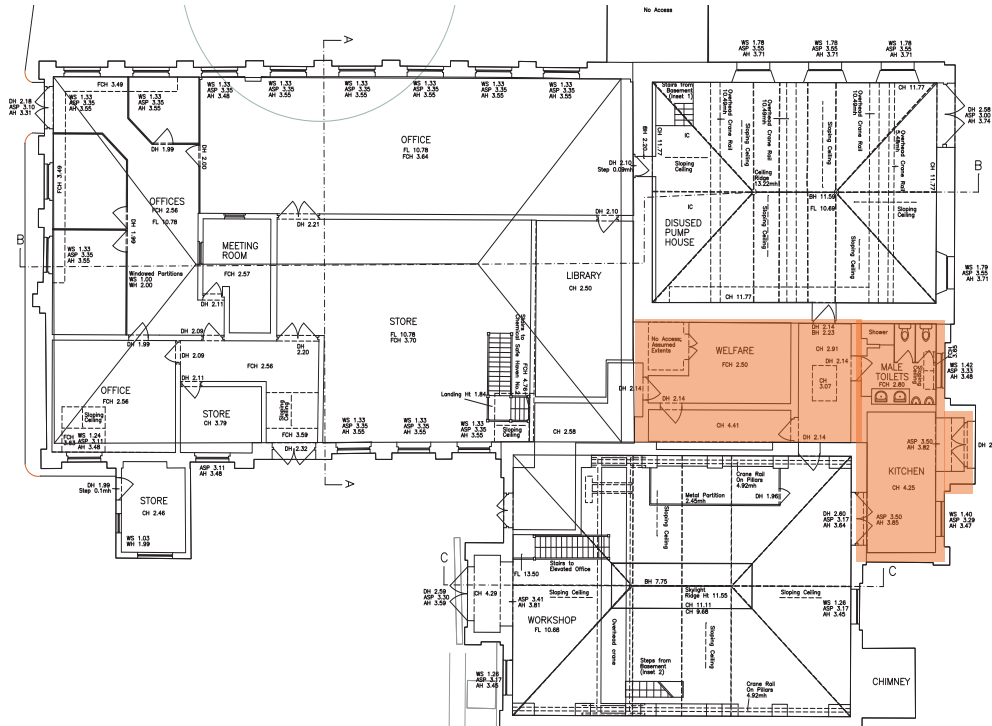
Location Plan: Ruston & Ward Building, ancillary spaces (originally part Sheffield's Boiler House)
